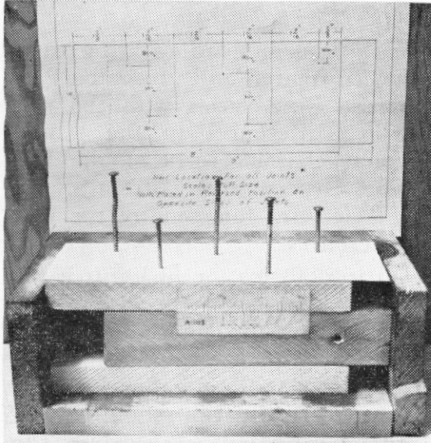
Fabrication jig and template for nail location. Note vernier on face of joint for measurement of slip under load.
